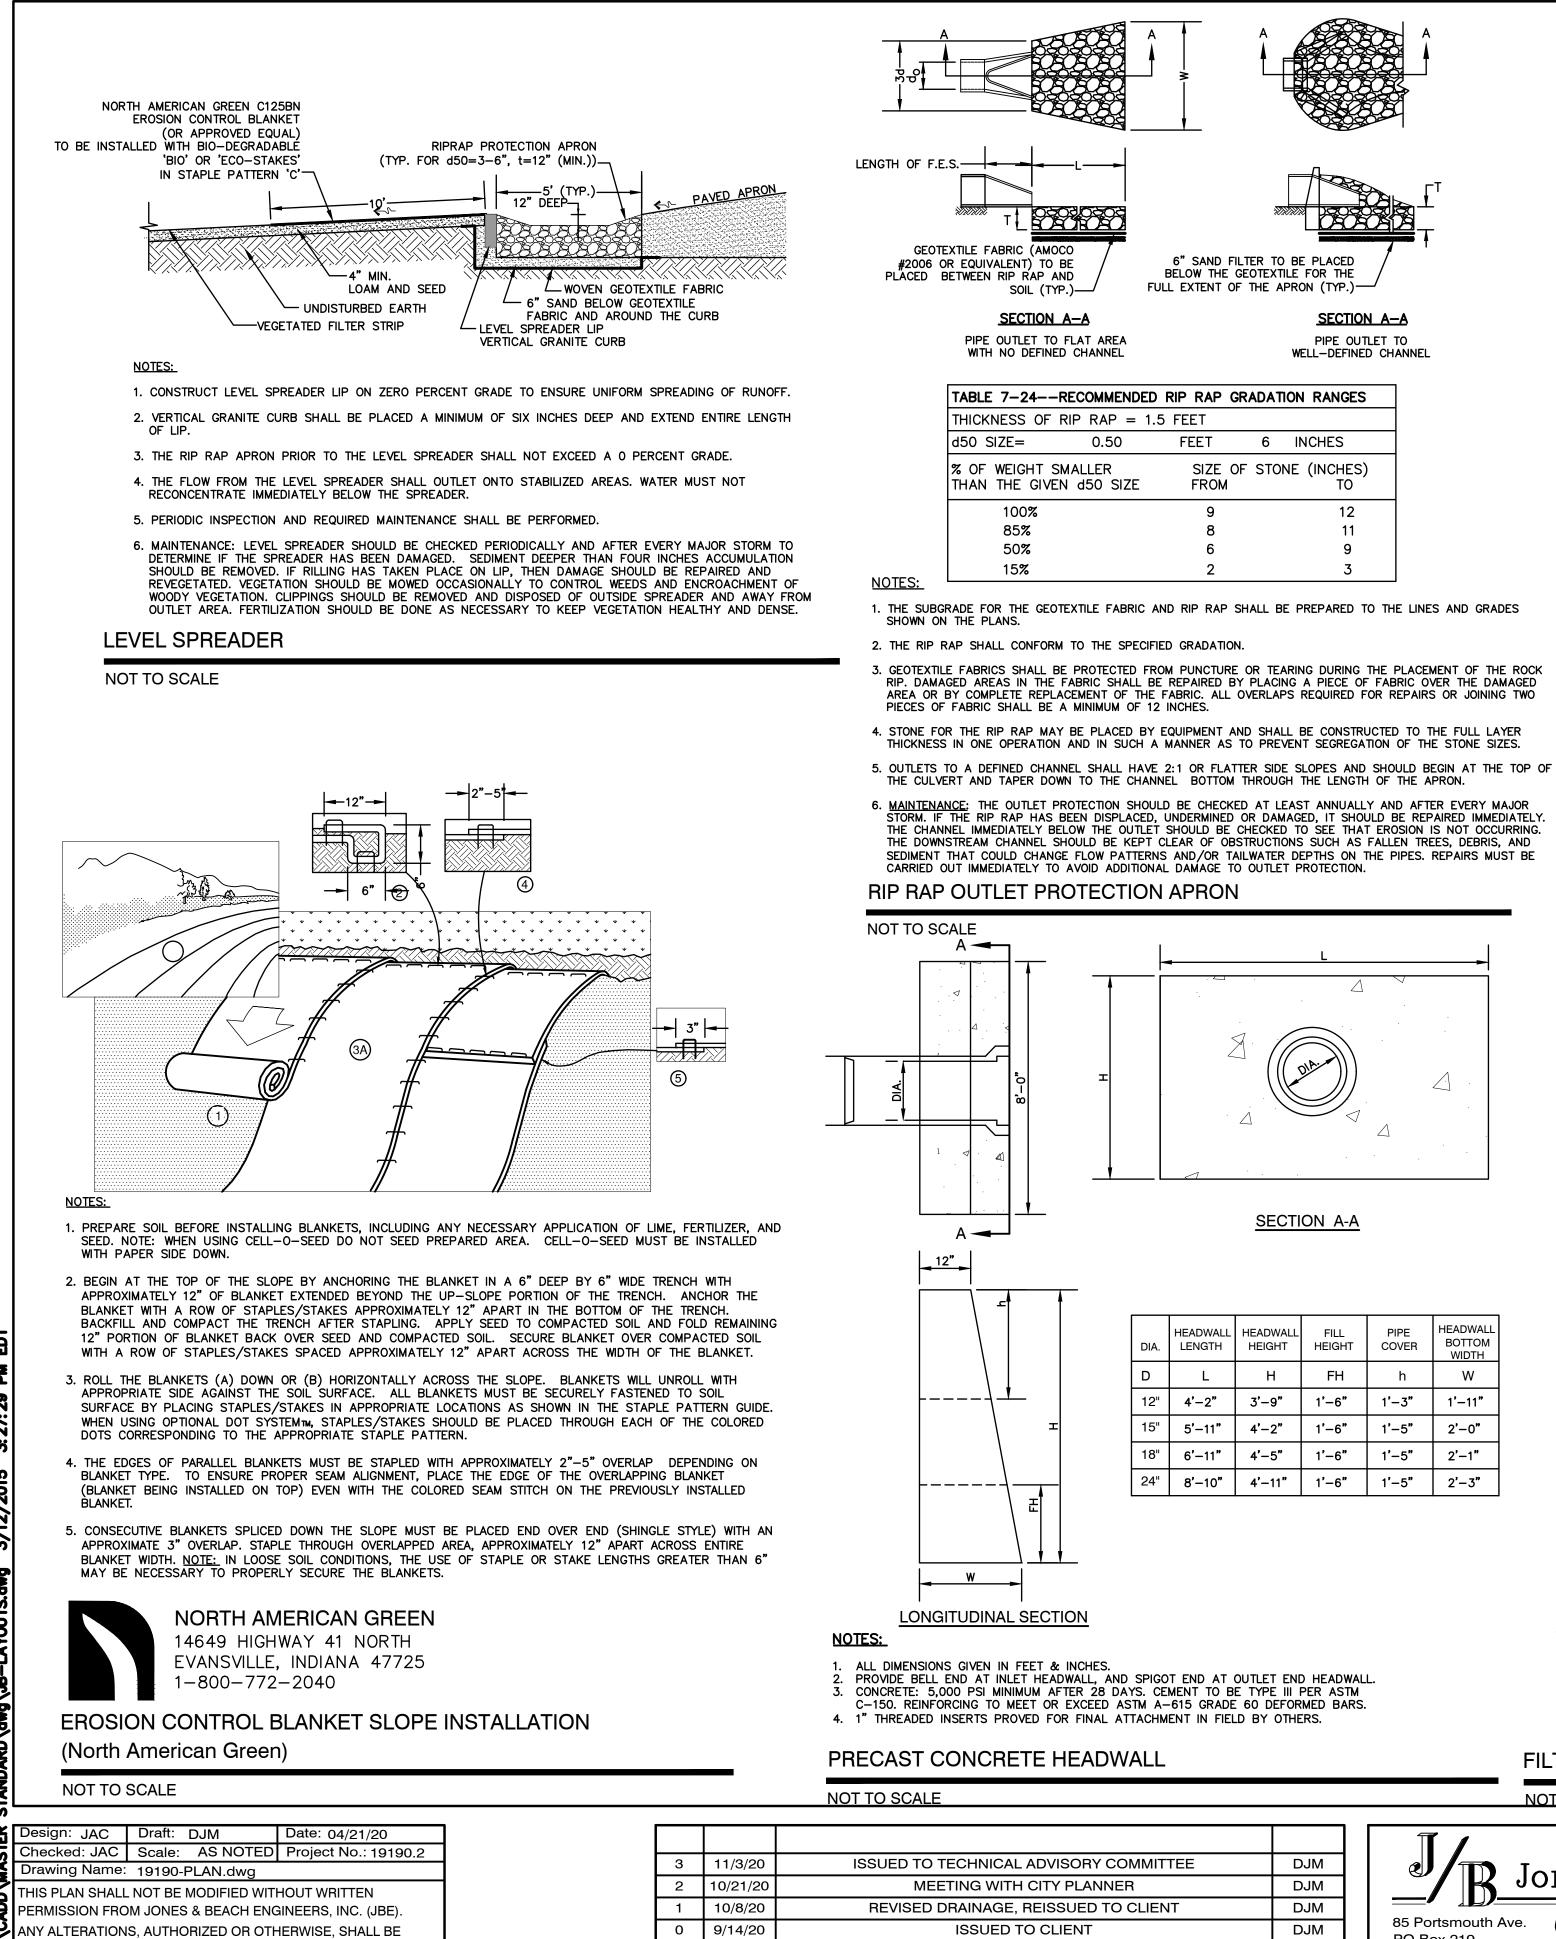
DETAIL SHEET INDUSTRIAL WAREHOUSE 375 BANFIELD ROAD, PORTSMOUTH, NH 03801 d: 304 MAPLEWOOD AVENUE, PORTSMOUTH, NH 03801
